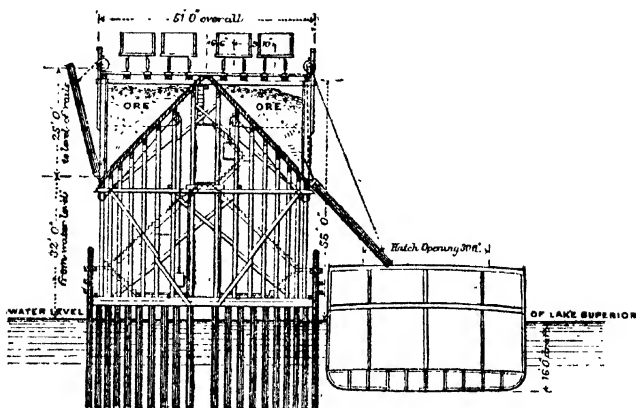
Cross section of wooden loading pier at Duluth, Minn., U.S.A.
